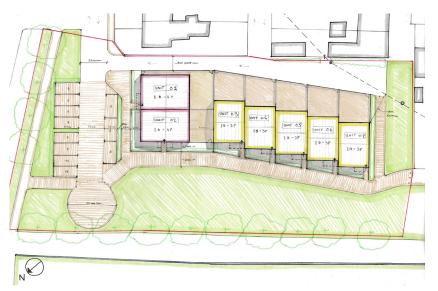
Preliminary Design Option 1: Sketch Site Plan for 7 no. units.
